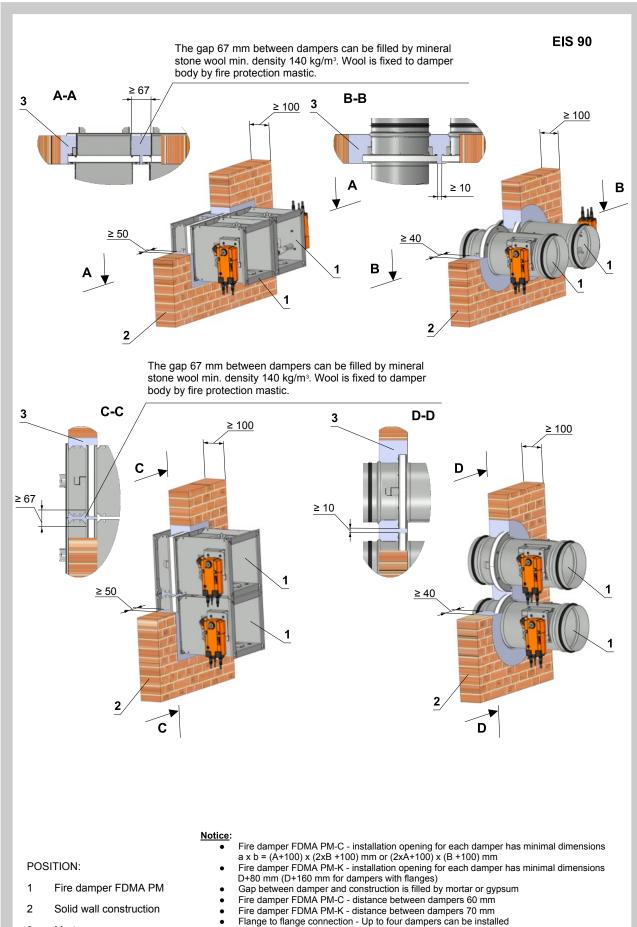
Solid wall construction - flange to flange - mortar or gypsum
